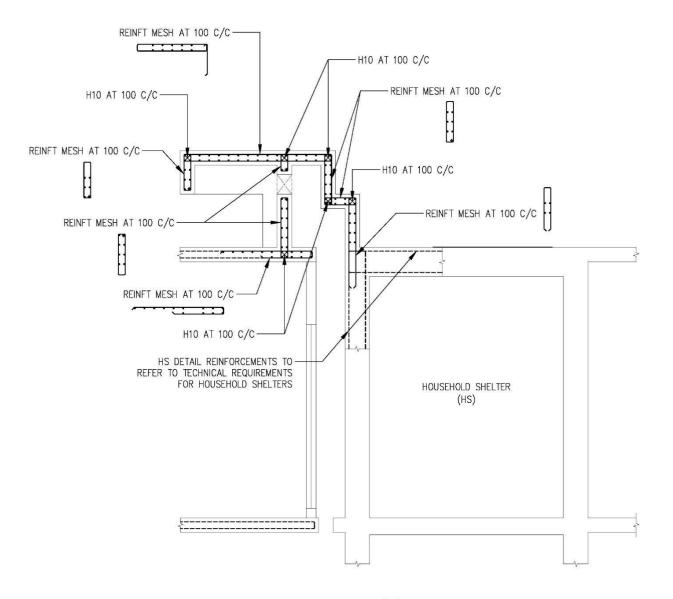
(a) REINFORCEMENT DETAIL OF REFUSE CHUTE ABOVE ROOF LEVEL
